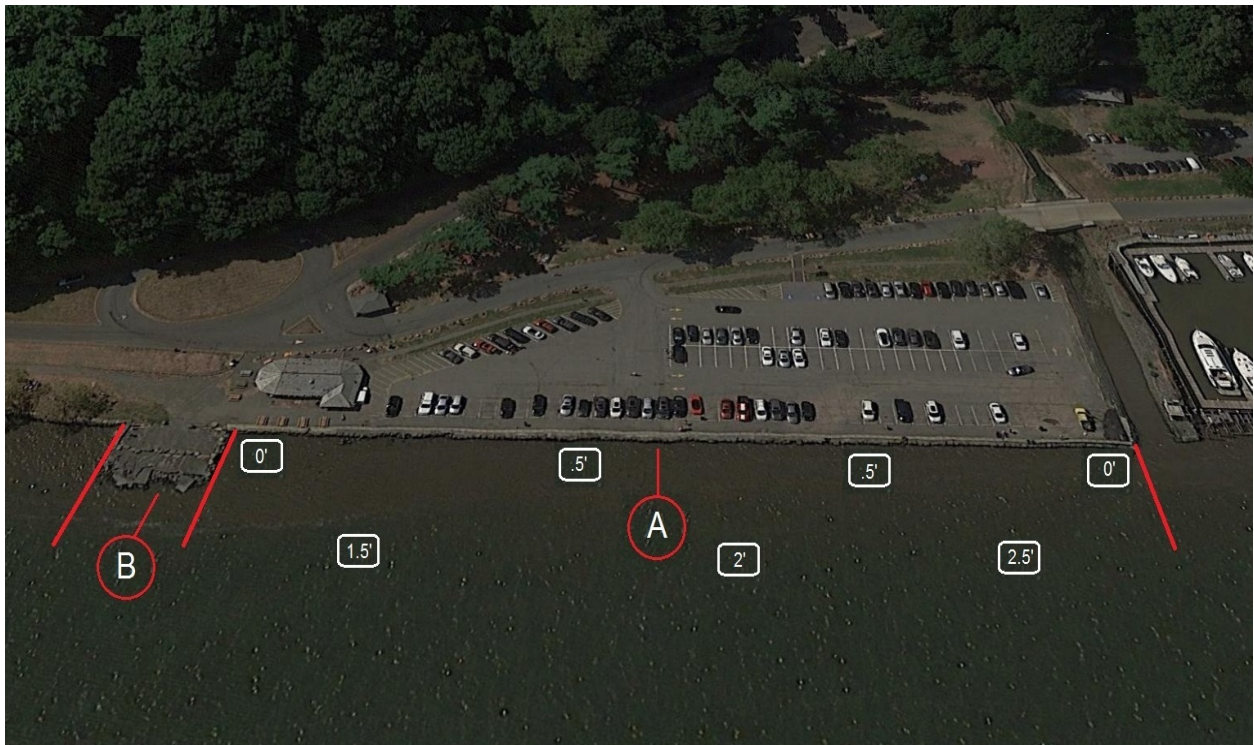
View to north of concrete and stone seawall. Note marina to the north.
